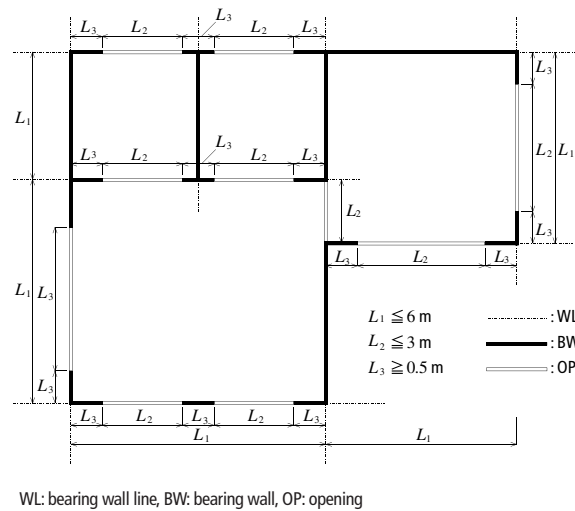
Floor plan divided by bearing wall lines (Arya et al., 2014, p. 113)
